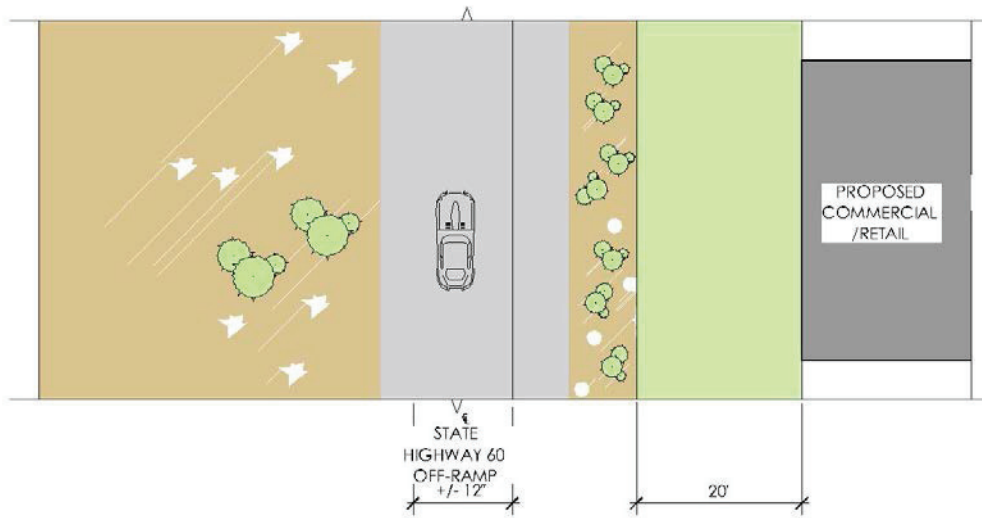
State Highway Off-ramp 60 Edge Plan J
